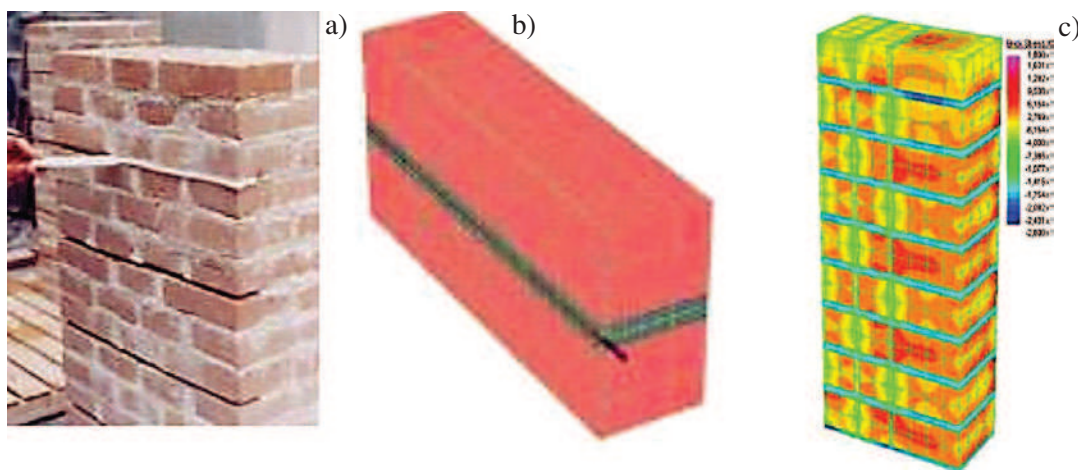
(a) Reinforced repointing using FRP laminates. FE modelling of masonry wall strengthened with FRP bars (b) and (c); [8]
